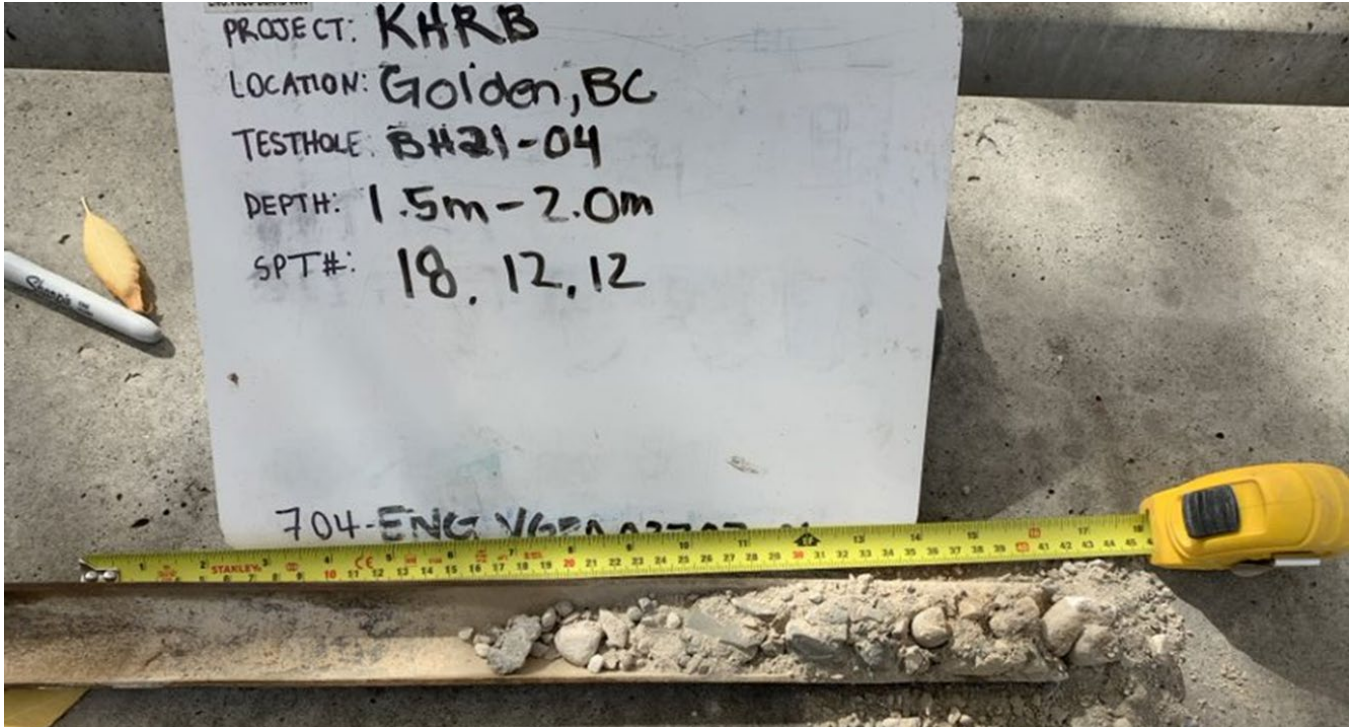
BH21-04, SPT-01, 1.5 m to 2.0 m
